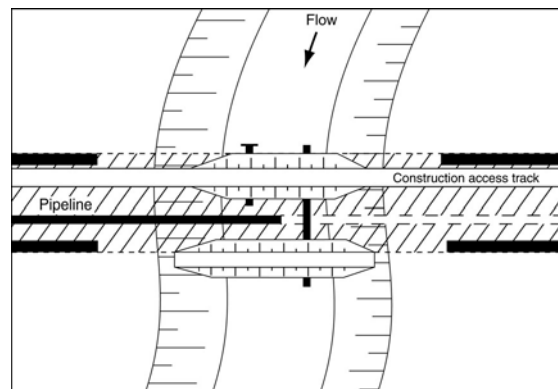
Stage 2 of pipeline installation with the other bypass pipe taken off-line to allow better access for pipe installation
